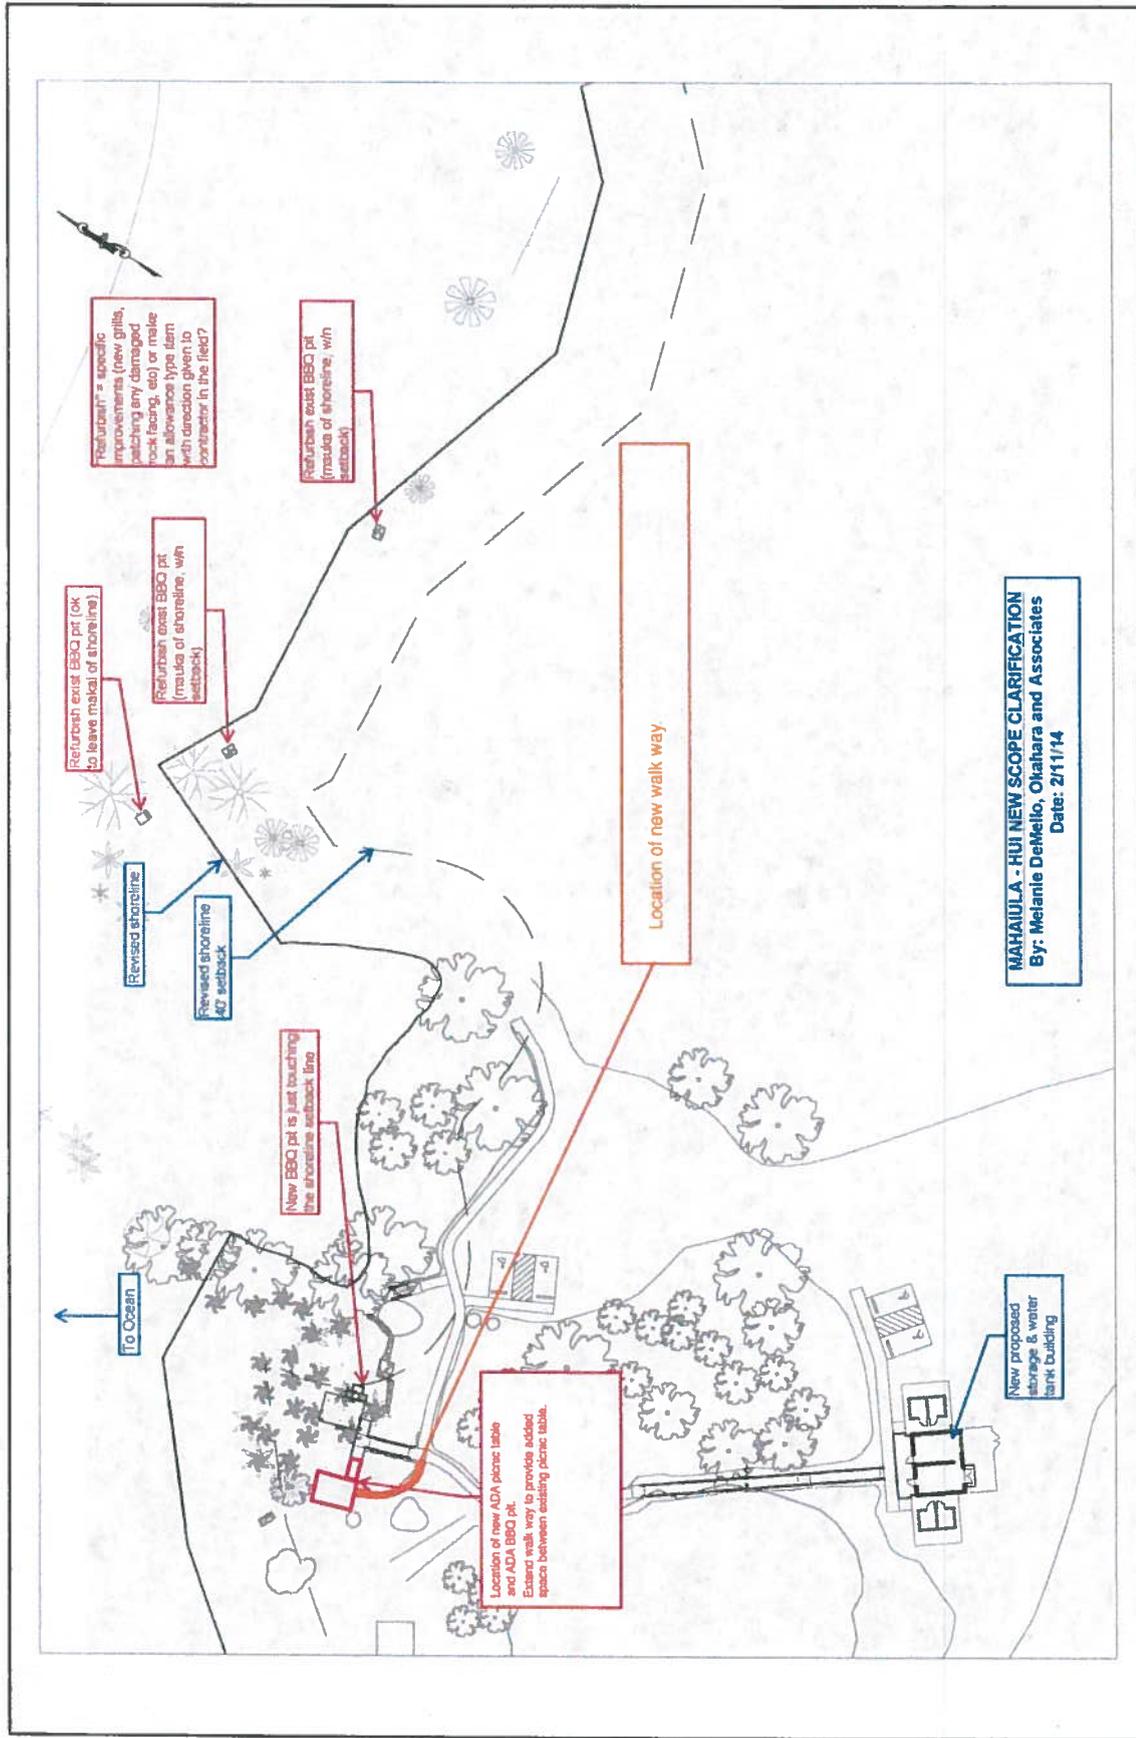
Construction plans showing the locations of a new storage/water tank building, new ADA picnic table, concrete pad, walkway, 2 new BBQ pits, and the refurbishment of 3 existing BBQ pits. at Mahai'ula.
